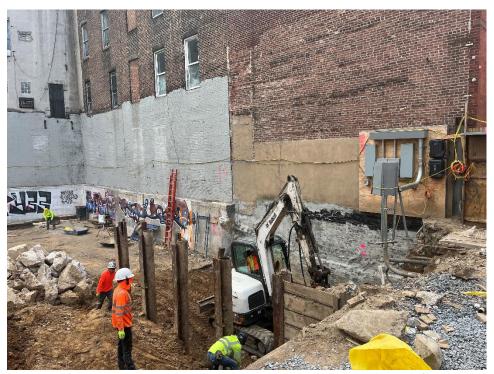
View of CAMP Station 1 and contractor removing existing lagging, facing southeast.
